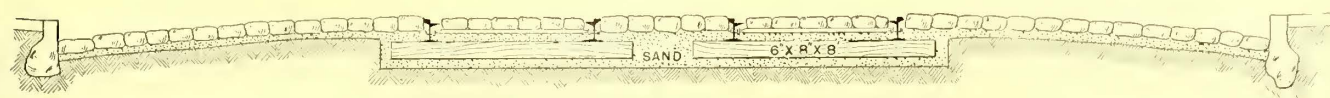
SECTION OF TRACK ON PAVED STREETS
